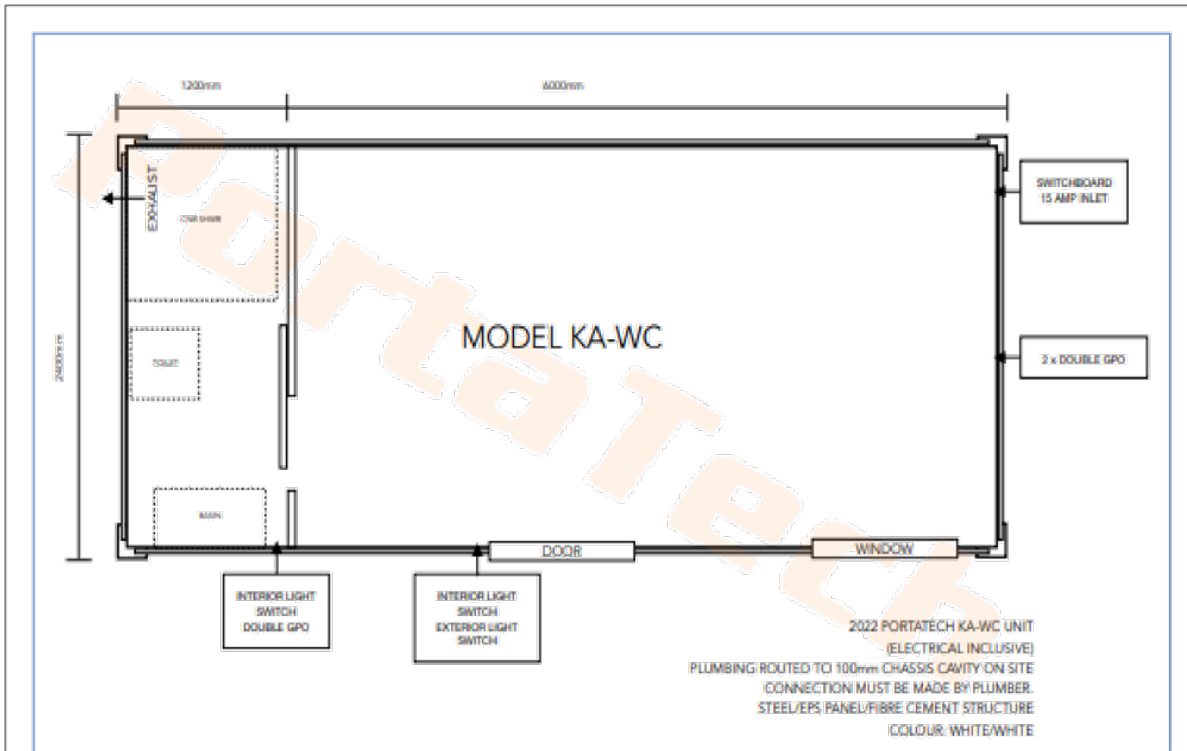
floor plan of accommodation units including plumbing and electrical layout
